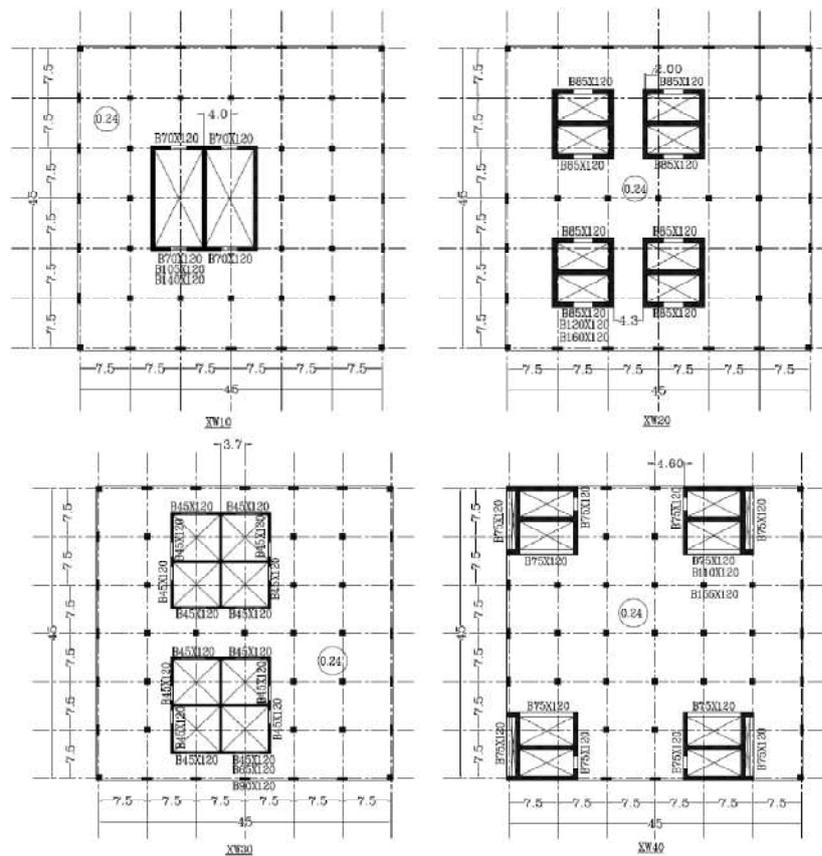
Structural Systems used in Core (Shear Wall) Case
